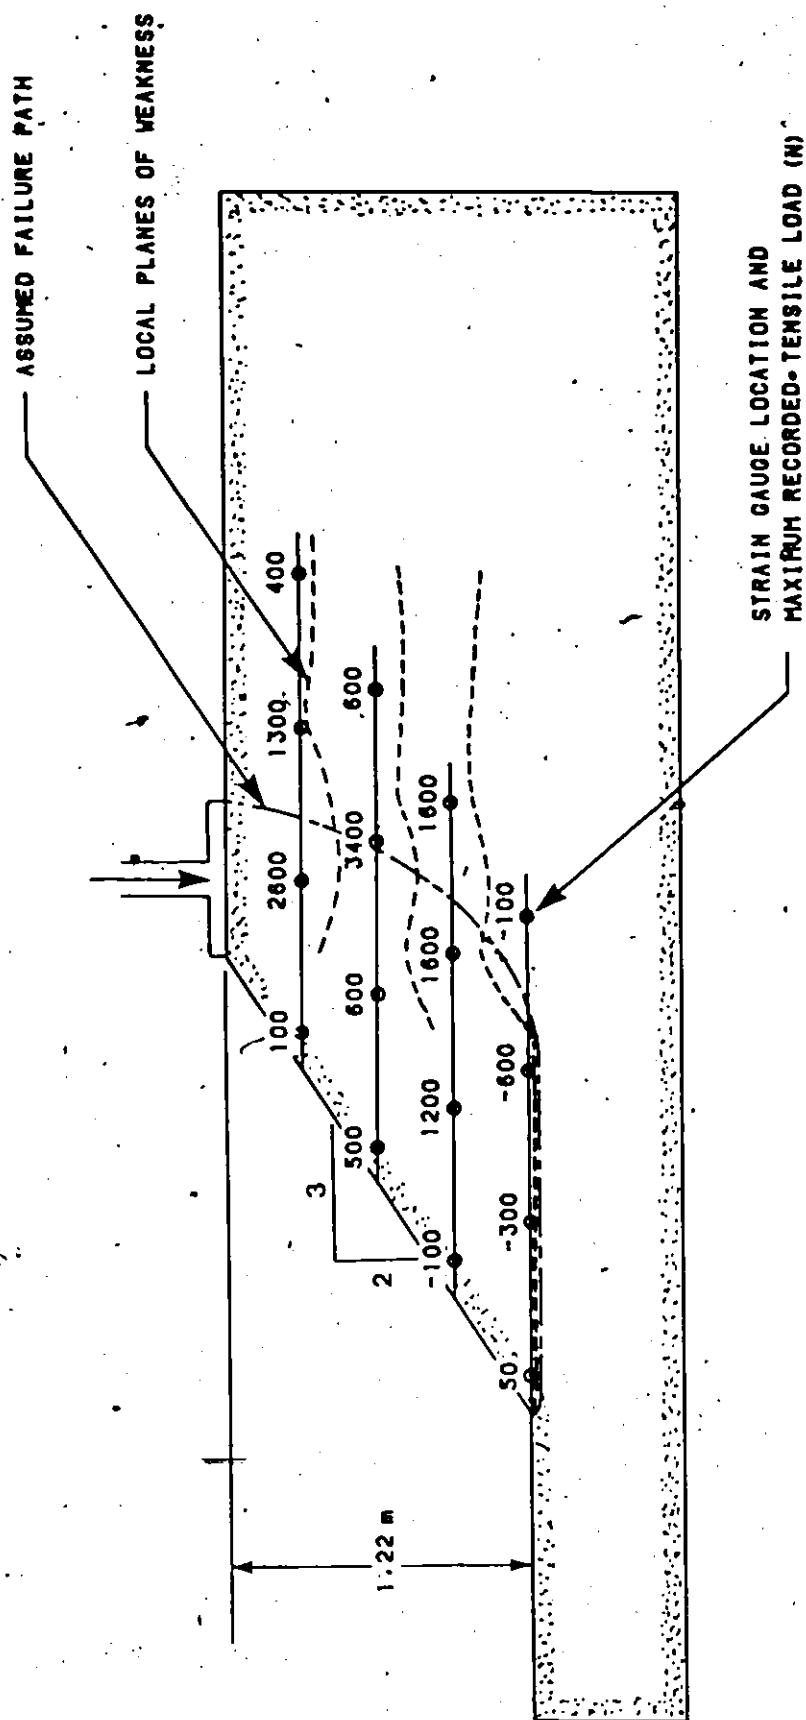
ASSUMED FAILURE SURFACE OF REINFORCED EMBANKMENT #1
